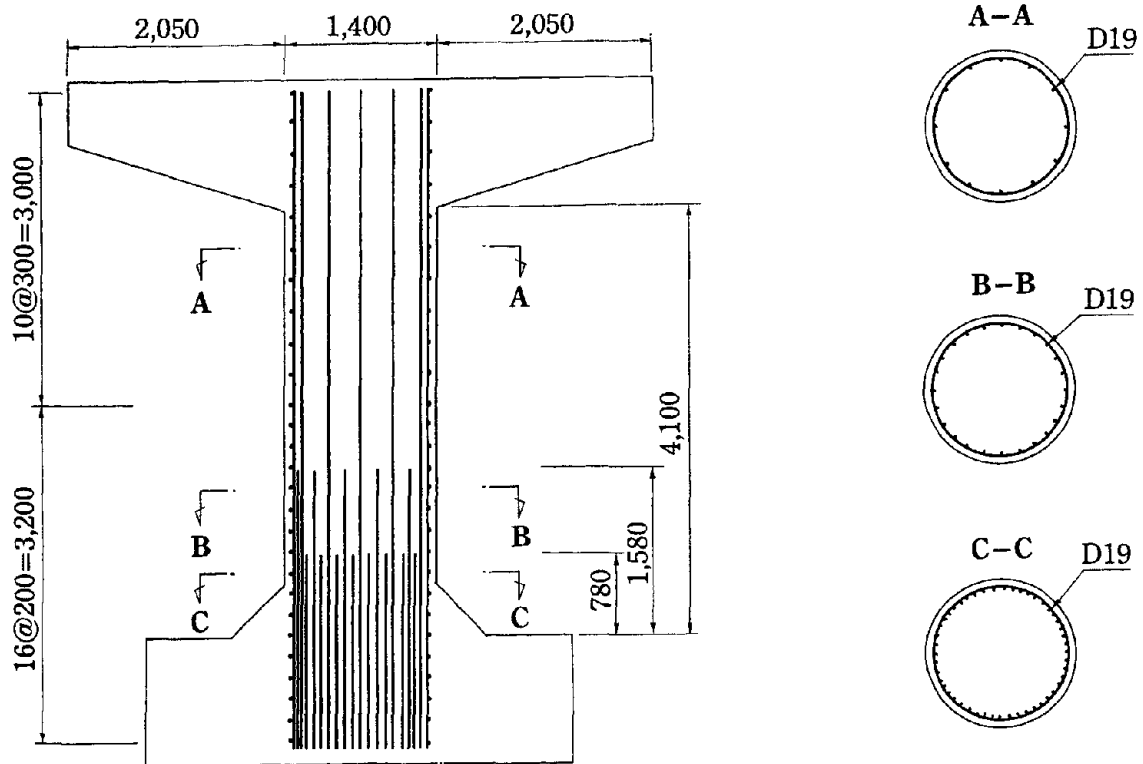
Layout of Longitudinal Reinforcement in Yoda Bridge Pier
